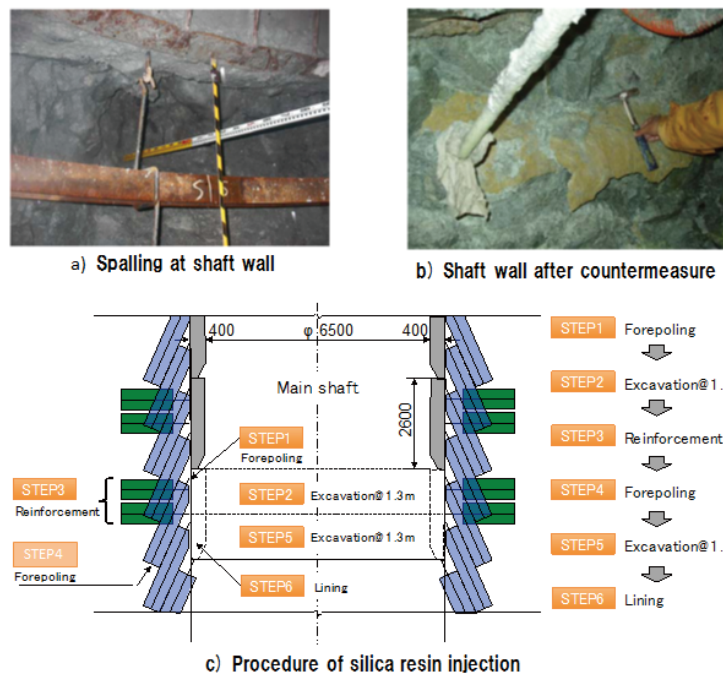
Countermeasures against spalling at the Main Shaft wall
